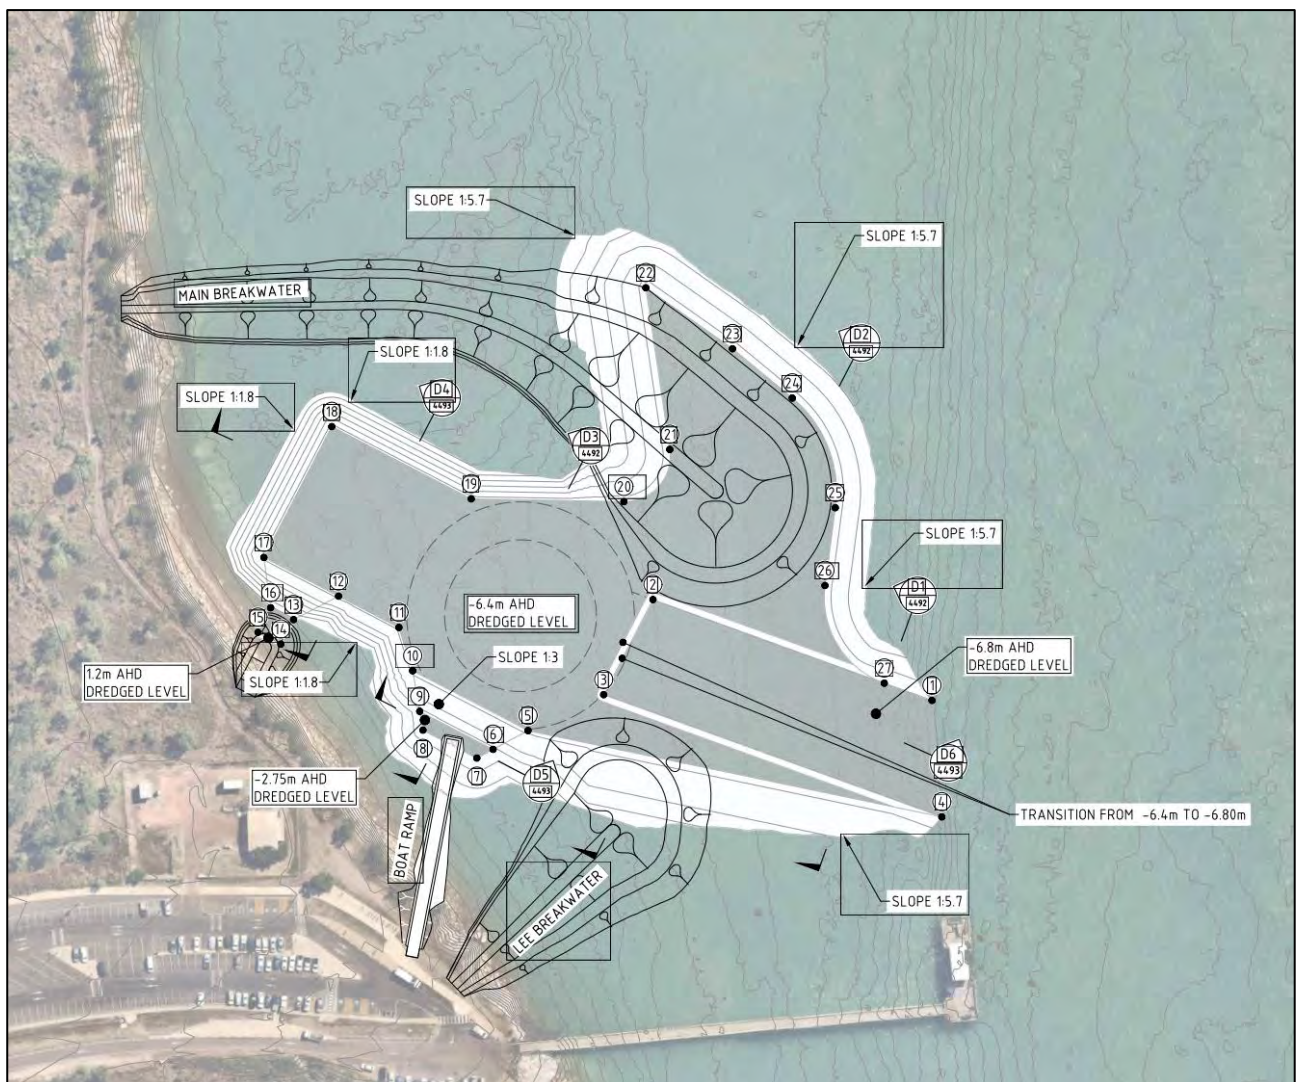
Dredge design layout (Design drawing R21-4491)
